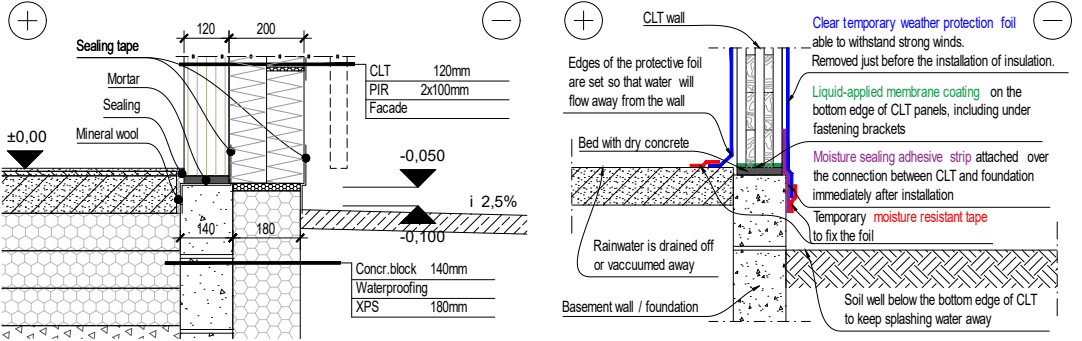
Design drawing (left) of the exterior wall to foundation connection and our proposal (right) of wetting mitigation practices.
